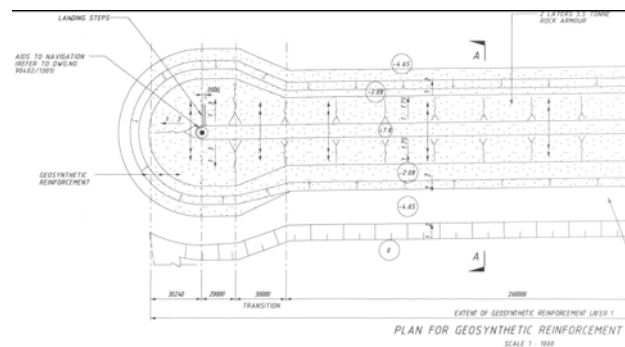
Arrangement of 3 layers of geosynthetic reinforcement at ends and 1 layer in central portion.
